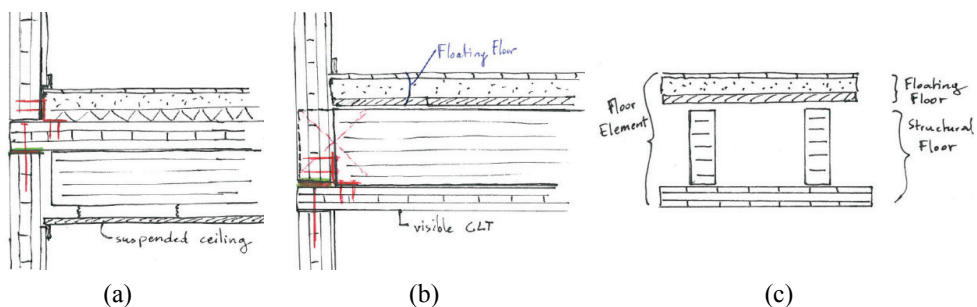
Conceptual floor element configuration: example sketches of wall-to-floor joint early details (a) with CLT at the top requiring a suspended ceiling, (b) “upside down” configuration with CLT at the bottom and floating floor (avoiding the need for a suspended ceiling), (c) “Upside down” CLT-glulam floor element (structural floor + floating floor) floor cross-section.
